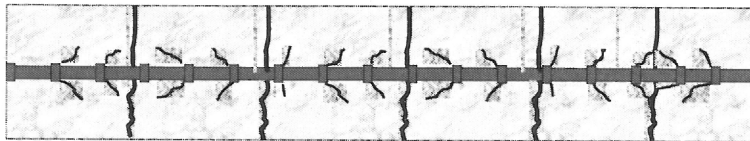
Cracking along a reinforcement bar [4]
